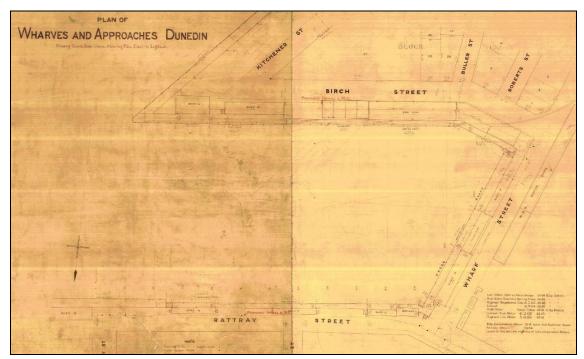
Historical plan showing structures near proposed SH88 deviation in 1911 (SO14691).
